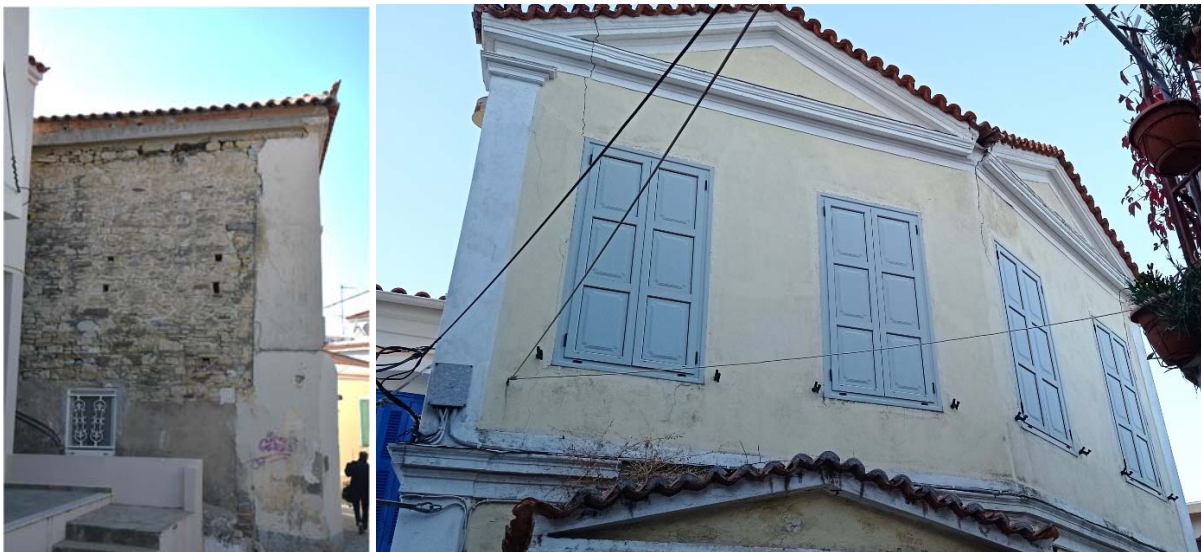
Shear cracks at mid-length of the walls and corner failures.
